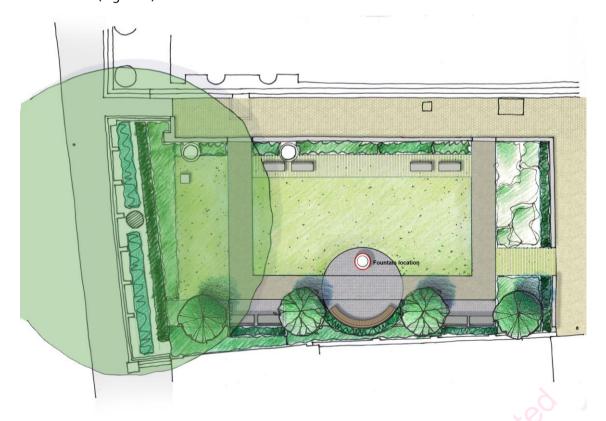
Proposed new location of Drinking Fountain at St Pancras New Church (ME Landscape Studio, 2020)
